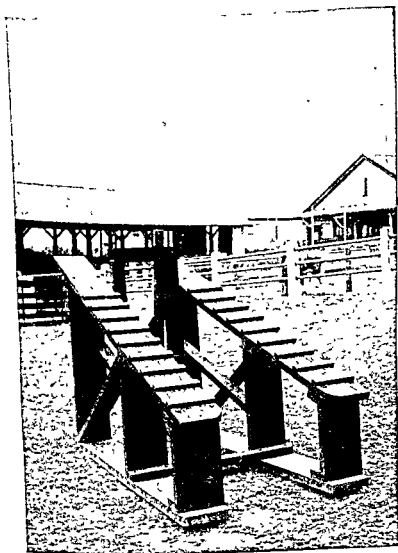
Breeding Rack. Dimensions, floor planks 9 feet long, front post 4 feet, and rear posts $1\frac{1}{2}$ feet. One and one-half feet between floor planks in front and 2 feet in rear.
